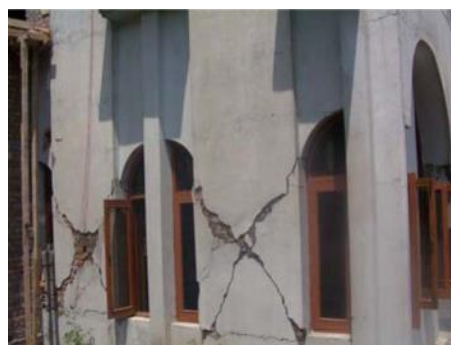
Diagonal shear failures of masonry piers [40]
